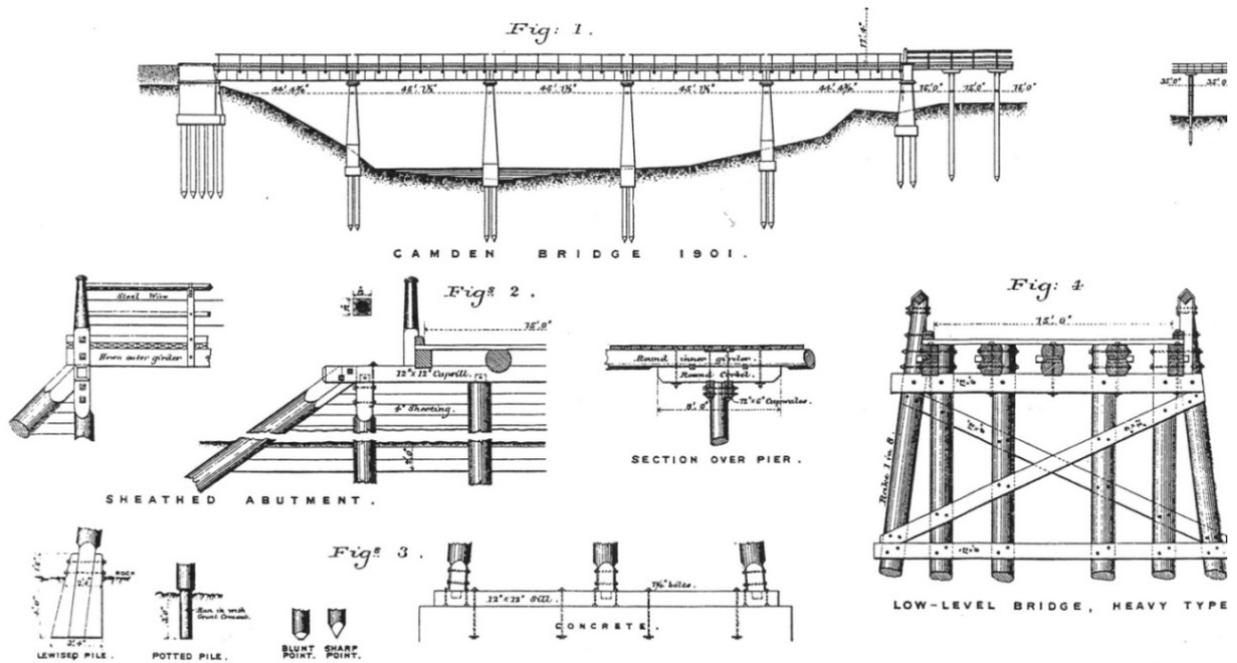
Plans for Camden Bridge, ca. 1901 (Dare, 1903)
